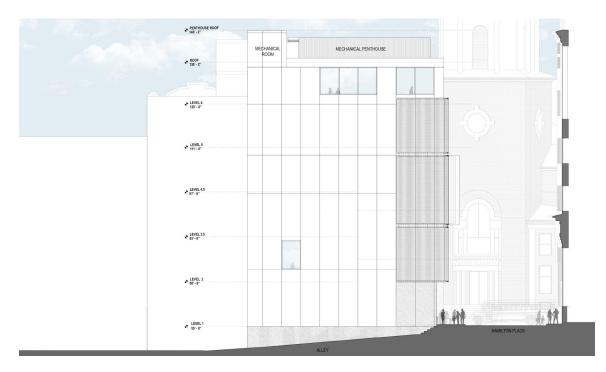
Facade Details of the Stainless Steel Metal Curtain
